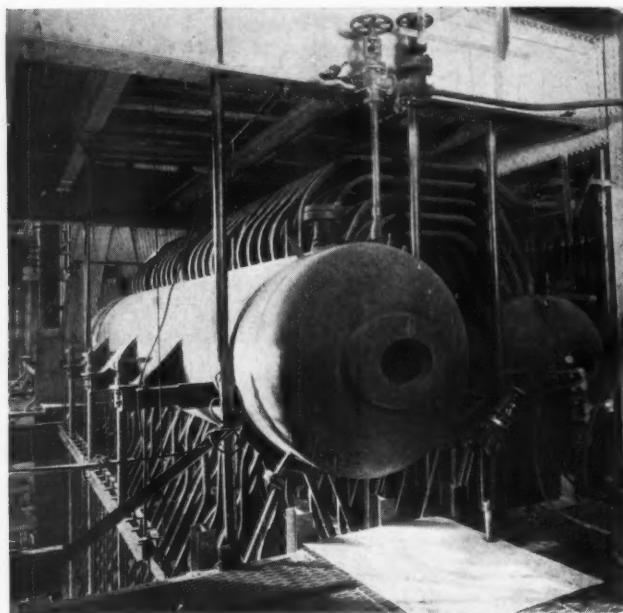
View of top of boiler during erection showing brackets on 60-in. steam drum which holds the economizer-suspension tubes
